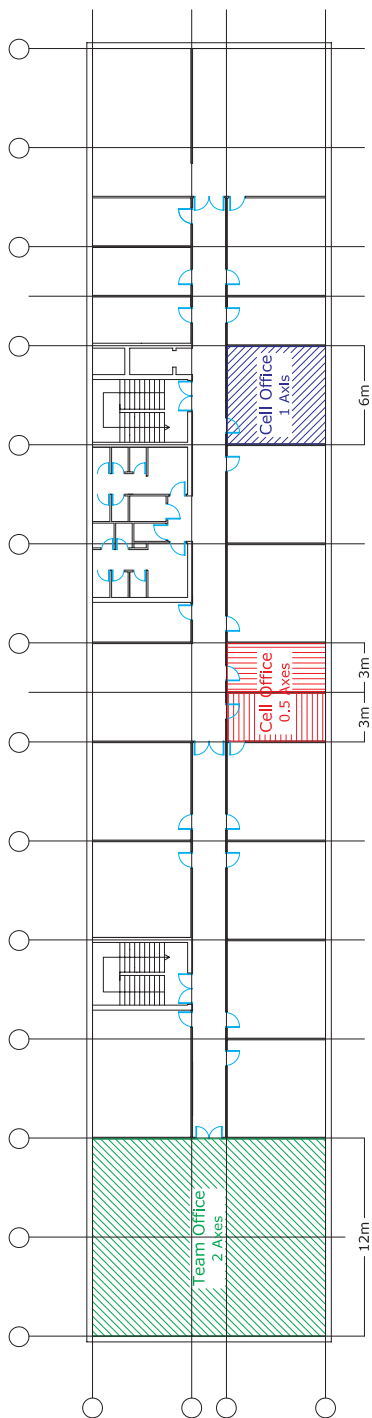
Arrangement of offices using a modular design for the New Generation Office Building
